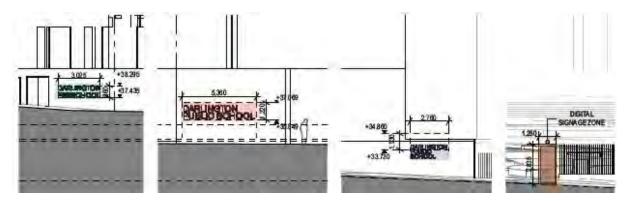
Elevation—signage. (Source: FJMT 2010, plan 3300)
